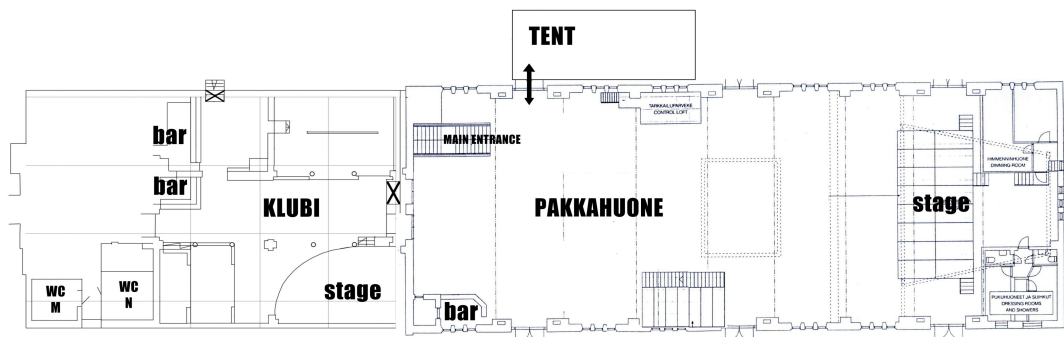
Floor plan of Tullikamari, Tampere – main floor, tent added
